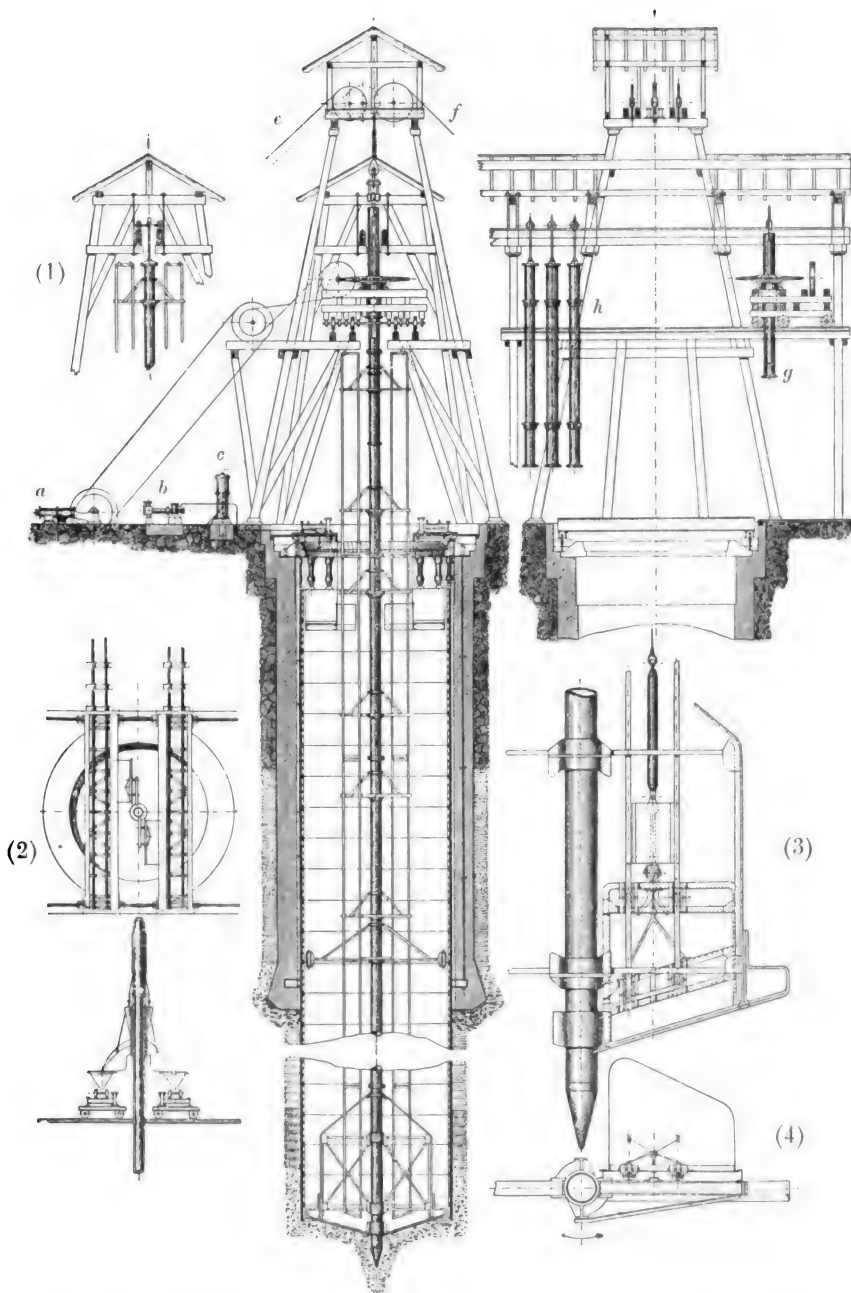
Sinking with Drum Shaft and Sassenberg & Clermont Boring Appliances at the Adolf Shaft of the Eschweiler Mining Co.
